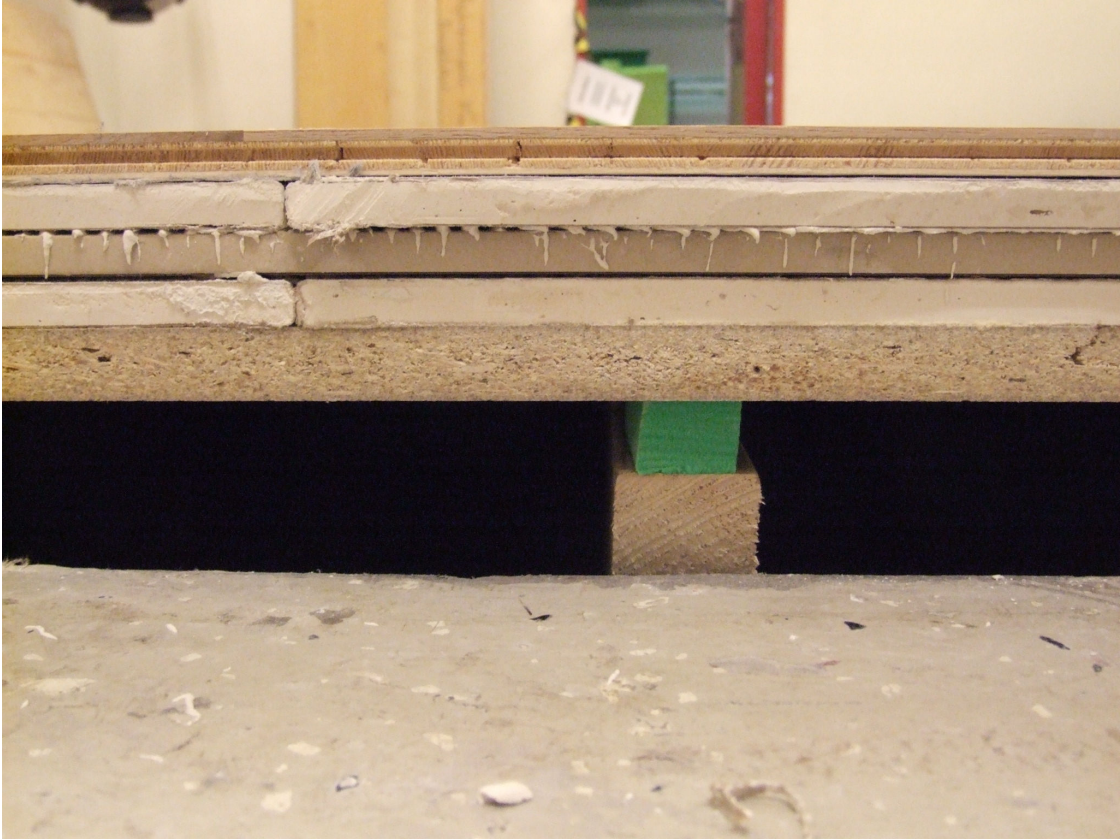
Gluing of the gypsum boards for the upper floors P12, L25 and L25 heavy.
